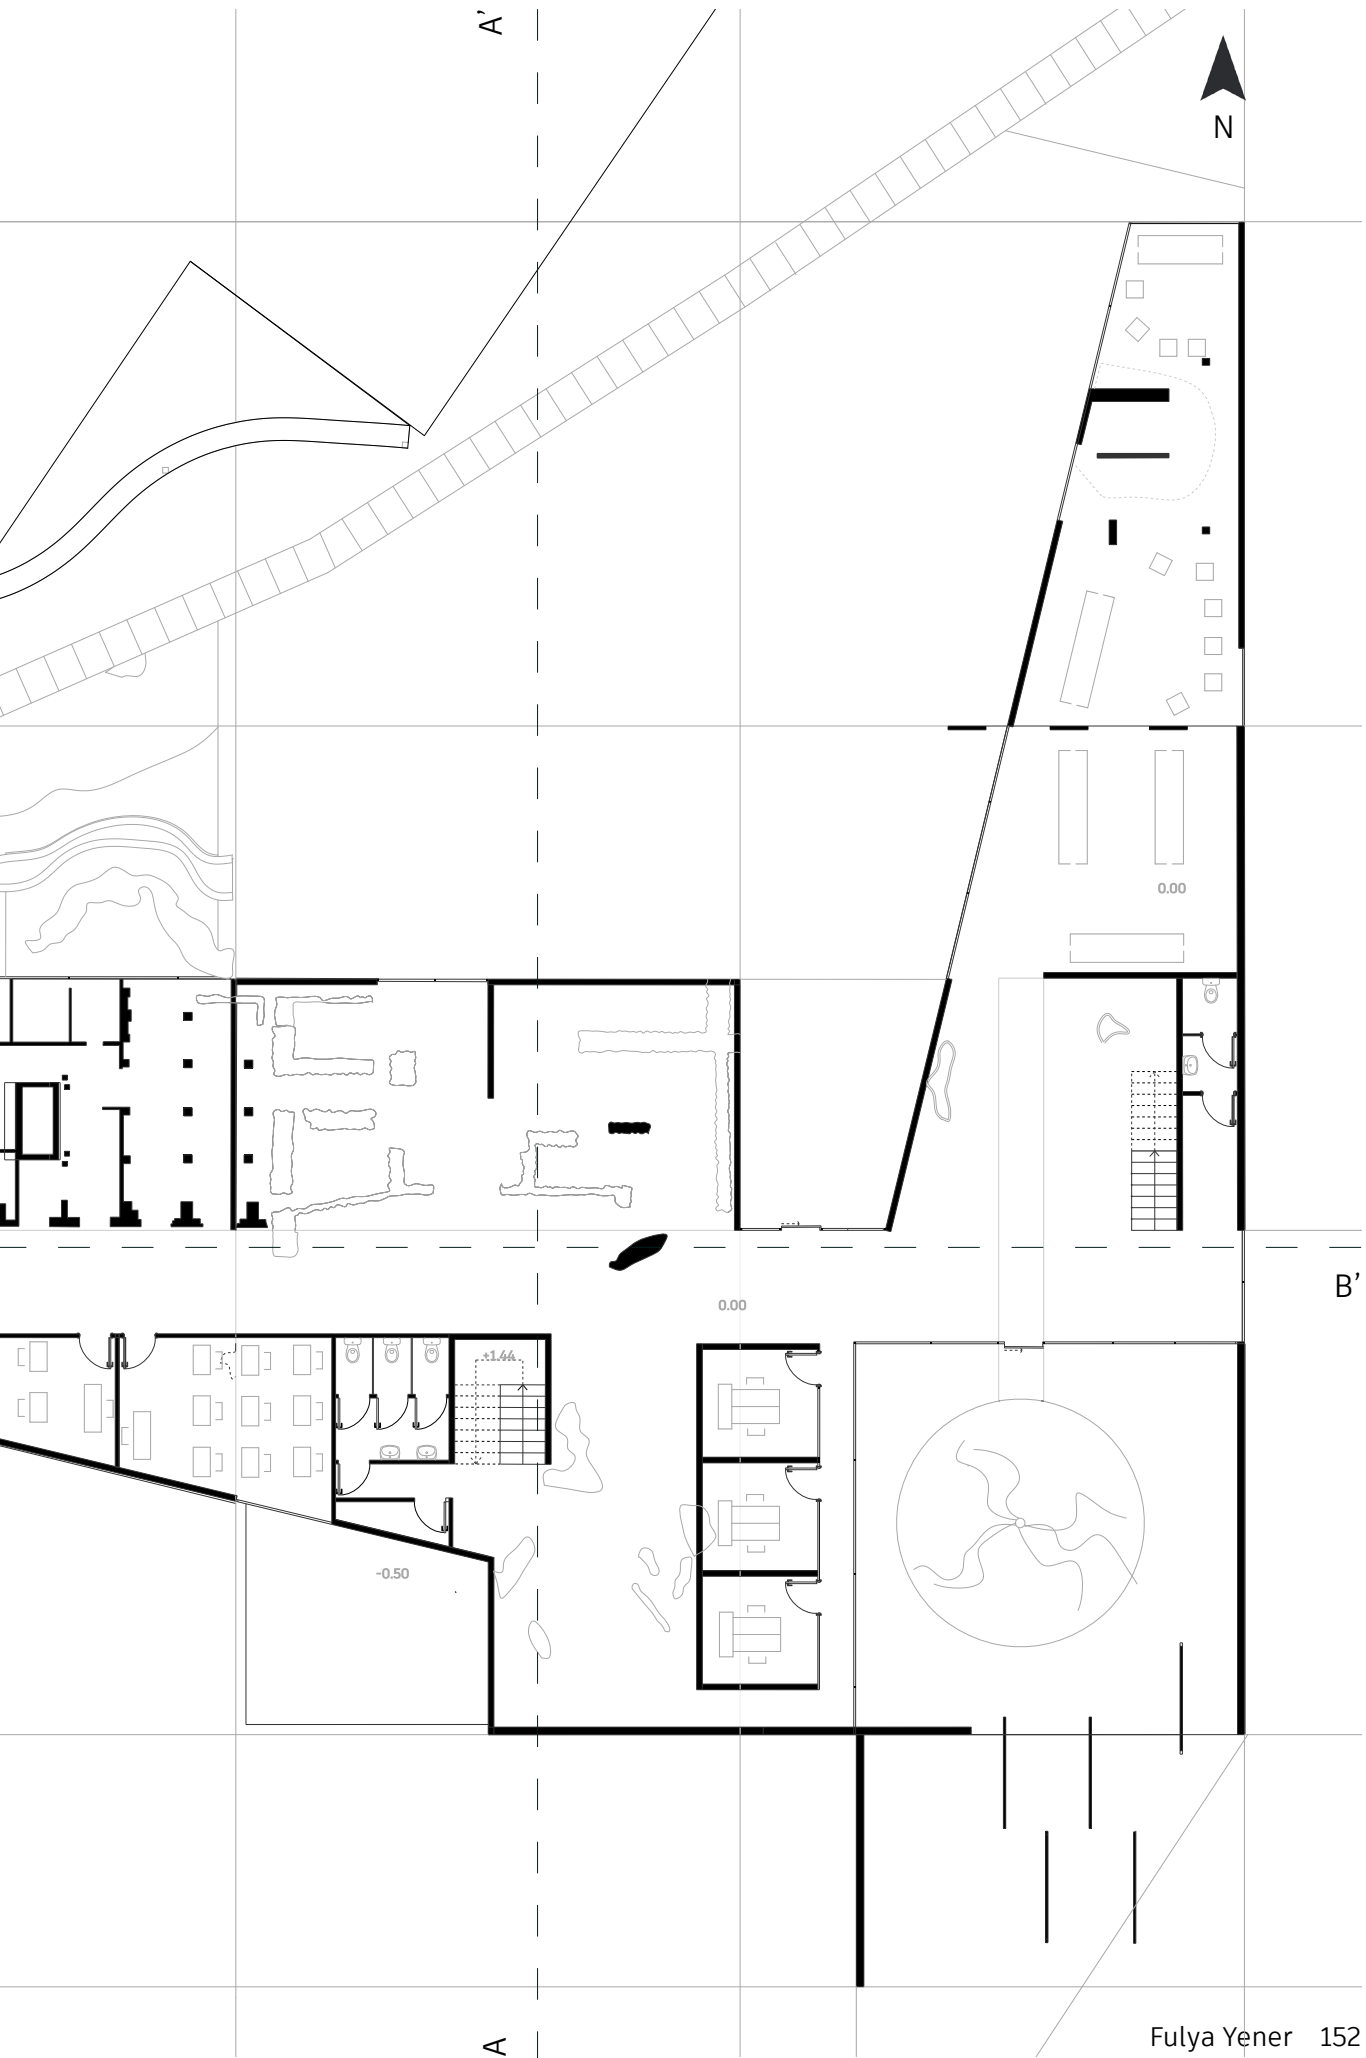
Ground floor plan. 1/200<sup>92</sup>
